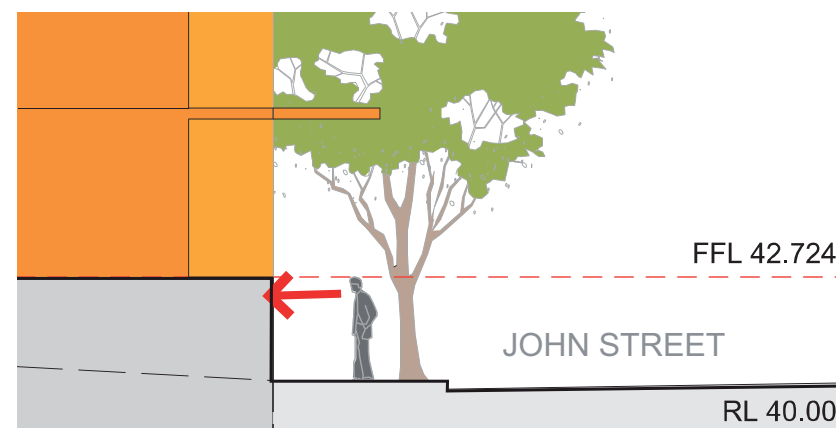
Section illustrating the height of minimum floor levels and associated impact on the adjoining street
